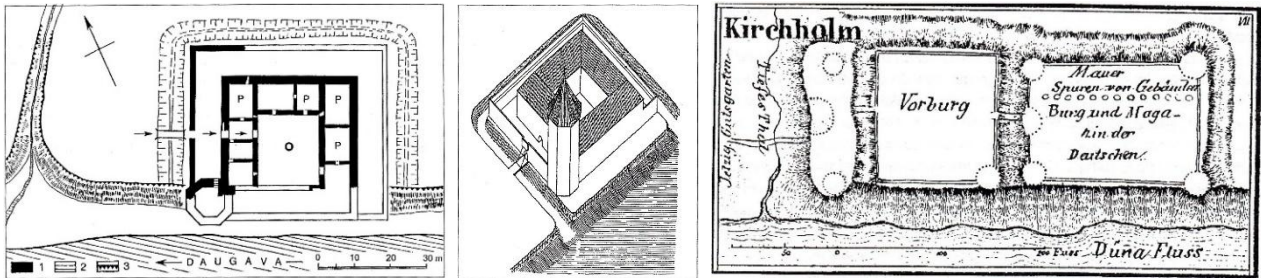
The reconstruction drawing of the Kirchholm Castle plan of the 14th cent. (Caune&Ose 2004: 448)
